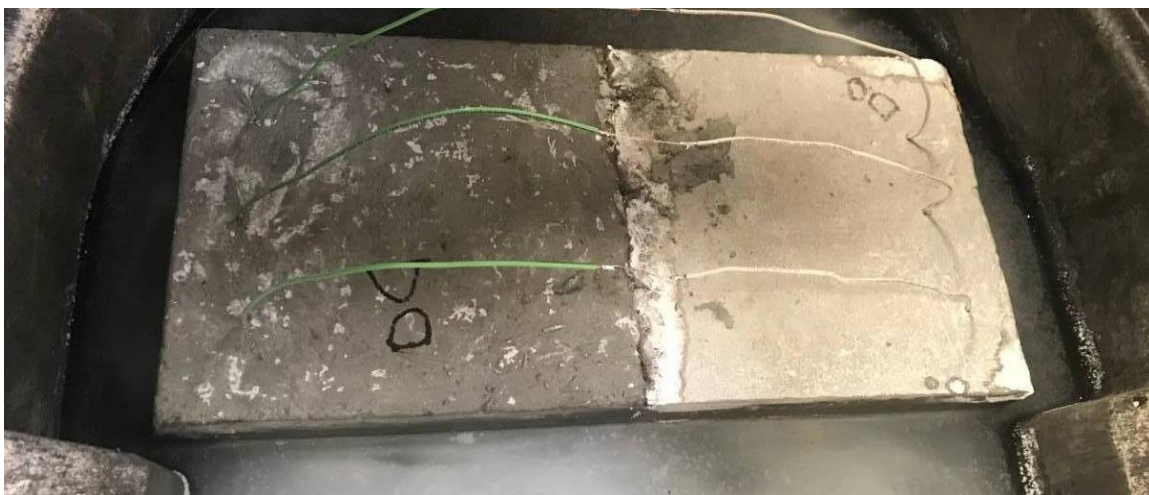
Joint Corrosion in Ductal® Small-Scale Corrosion Testing Specimen- Patching
